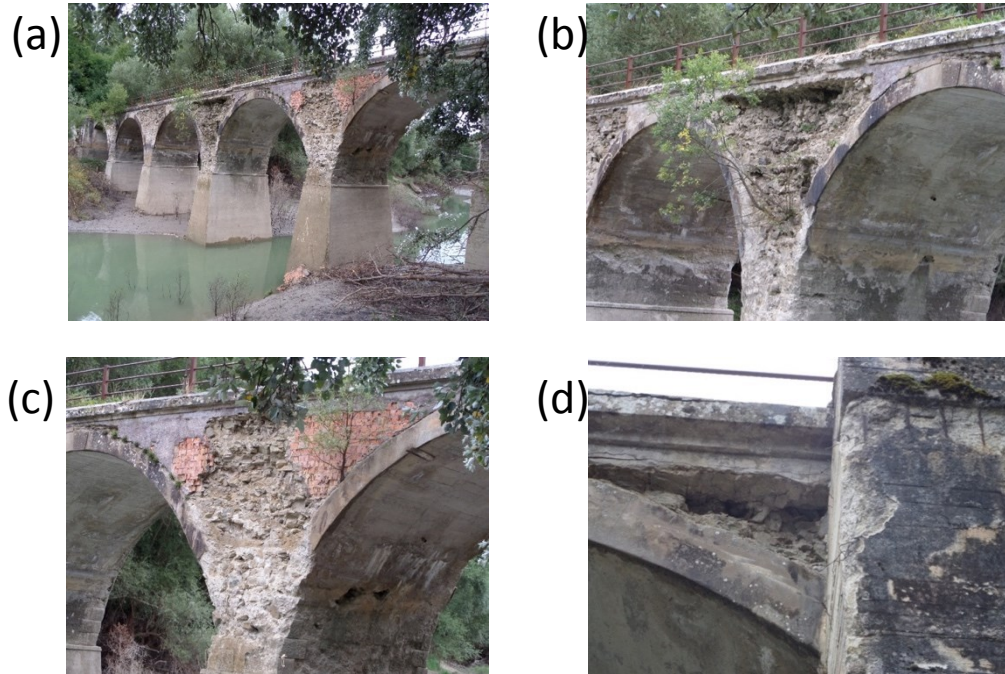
Ponte a Cinque Occhi - Masonry bridge (42.623178 deg, 13.250428 deg): (a) view of the 5 bridge arches, (b, c) partial collapse of the bridge masonry with evidence of previous structural interventions, (d) detail of the bridge-abutment connection.
